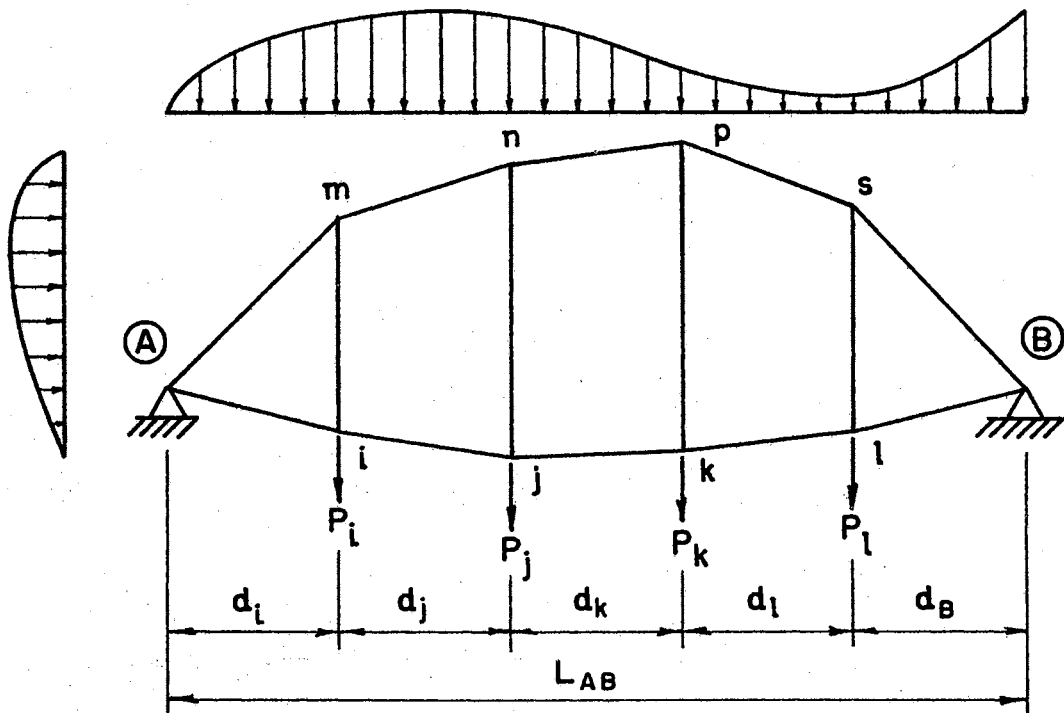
Vierendeel Truss with Inclined Members--Unsymmetrical Loading.
